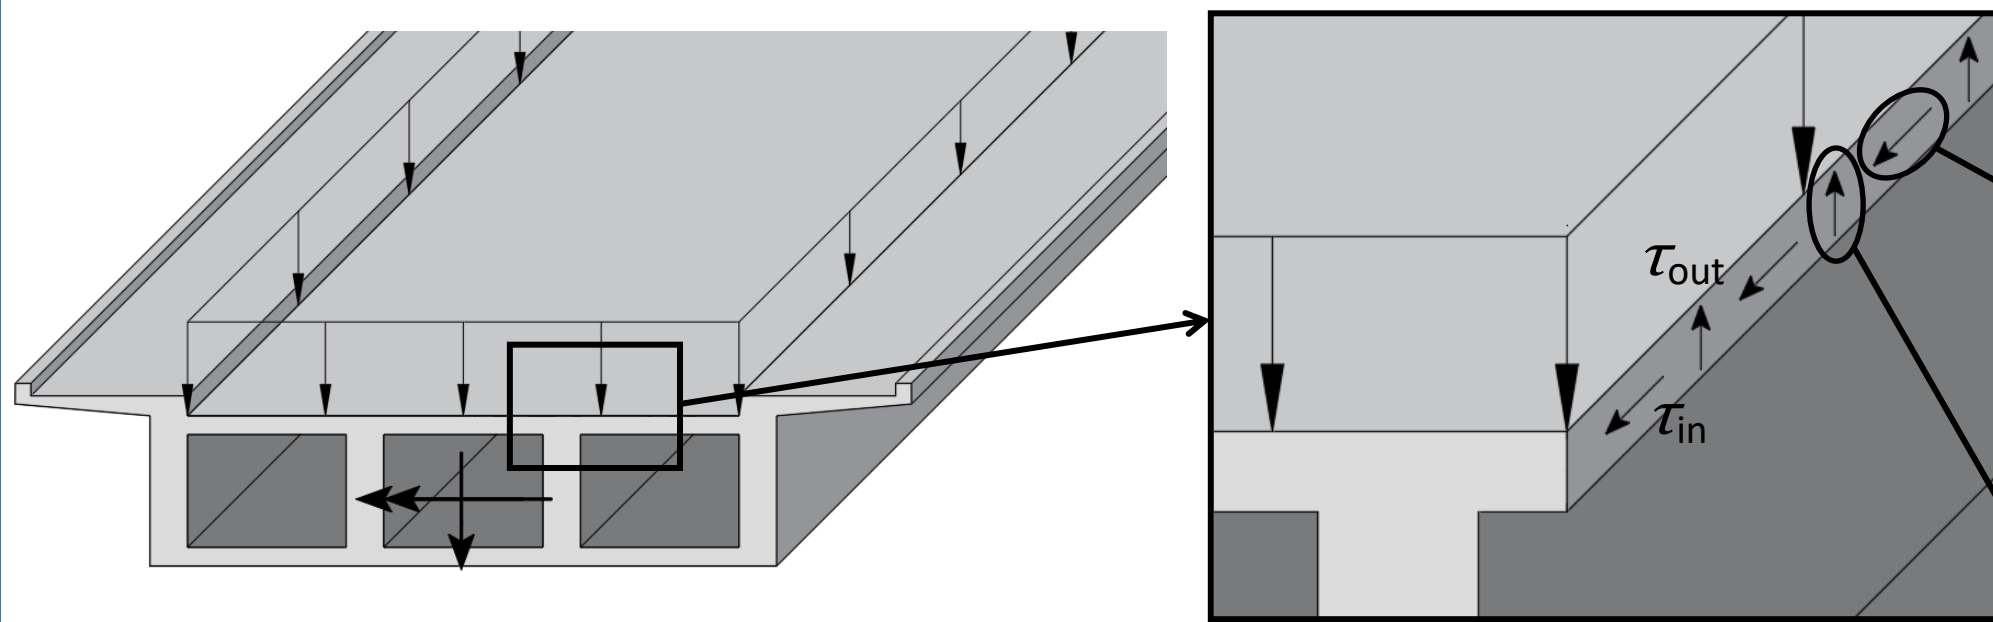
Illustration of a box girder bridge subjected to distributed vertical loading (left) and the acting in-plane shear (τ_{in}) and out-of-plane shear (τ_{out}) in a cross-section of the top slab (right).
